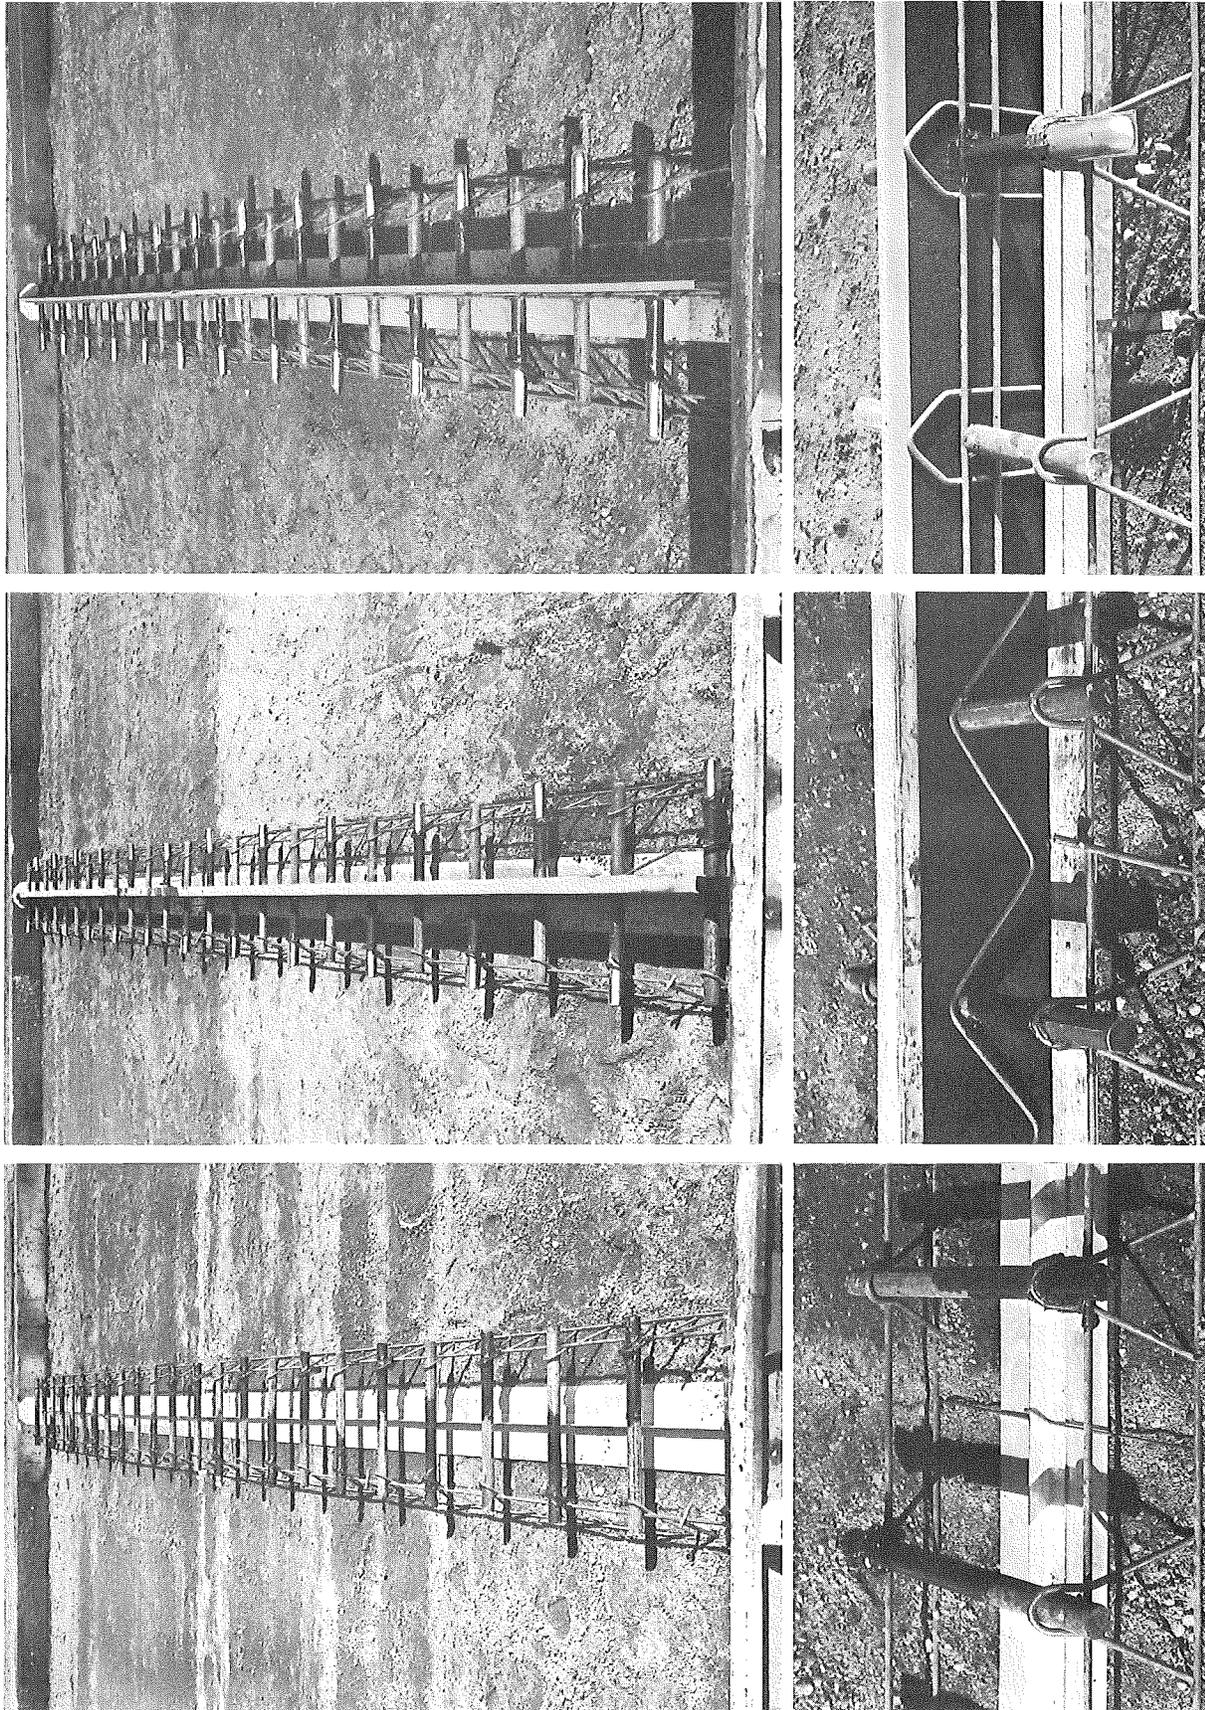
Overall and closeup views of typical assembly installations: standard contraction assembly (left), standard 1-in. expansion assembly (center) and expansion-contraction assembly (right).
